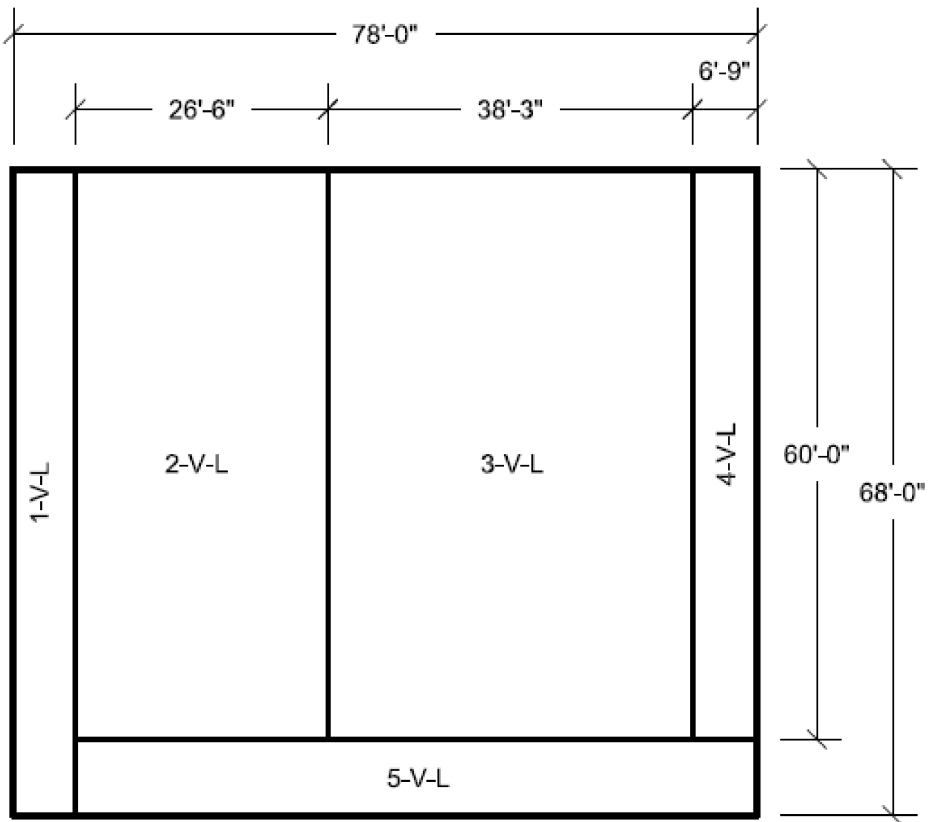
H.6-57 Pump House East Wall Looking West Vertical Reinforcement Zones Near Side Face
